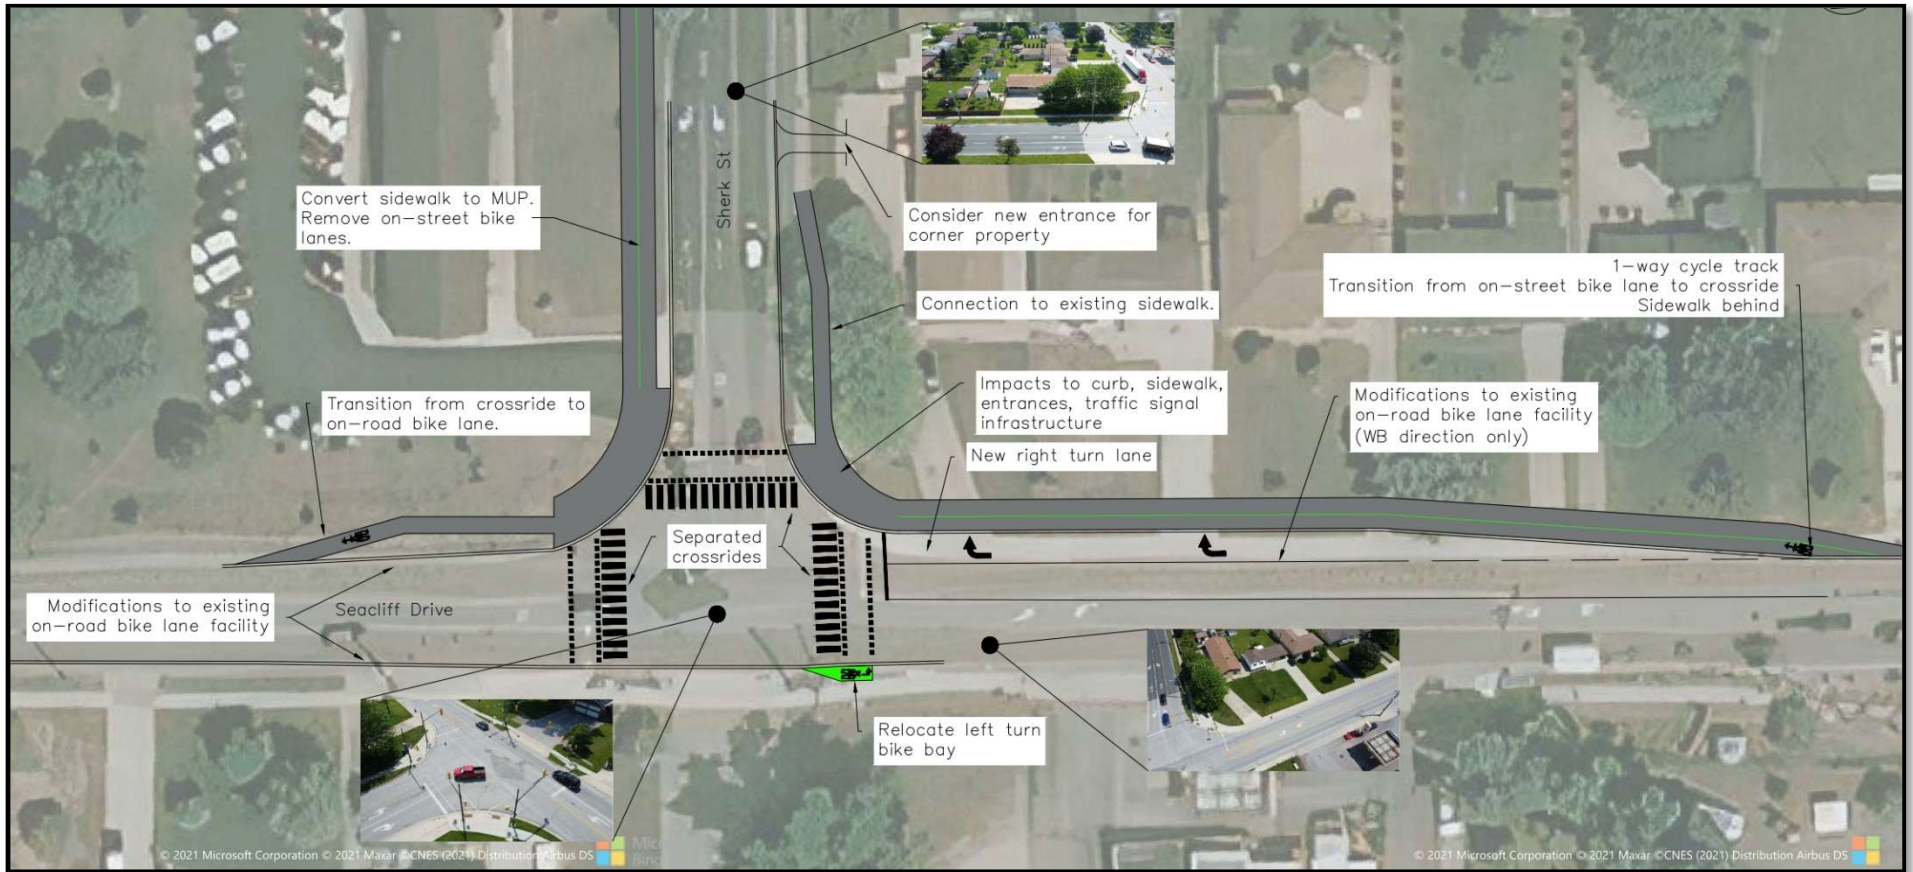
Sherk Street at Seacliff Drive AT Facilities
